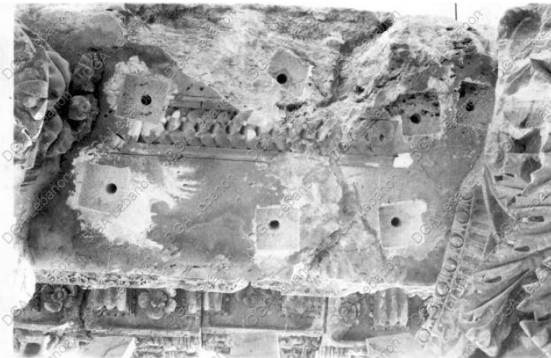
The underside of the stone lintel to the west that is cracked in two. Vertical rods with through plates that are embedded in the underside of the stone extend up through the stone and are believed to be connected to the reinforced concrete cap on top of the stone lintel. Photograph taken during the French Mission, circa 1930s.
